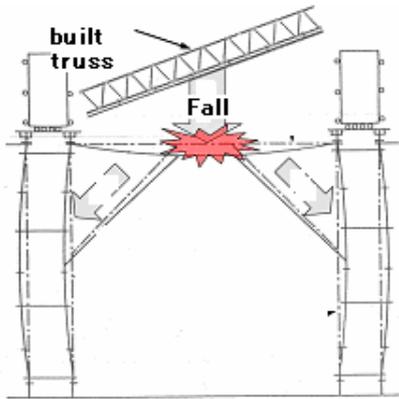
The bend of the pillar by the built truss falling (Source: the Ministry of Labor report)
